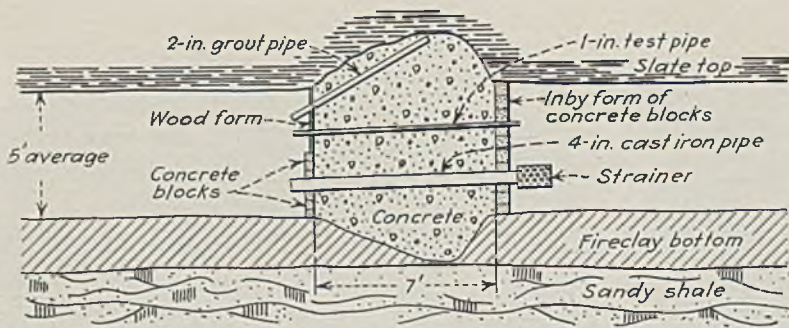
Side view of a bulkhead in Saxton No. 1 mine for which the hitchings are made with a cutting and shearing machine. Rib hitchings in coal have the same shape and taper.
